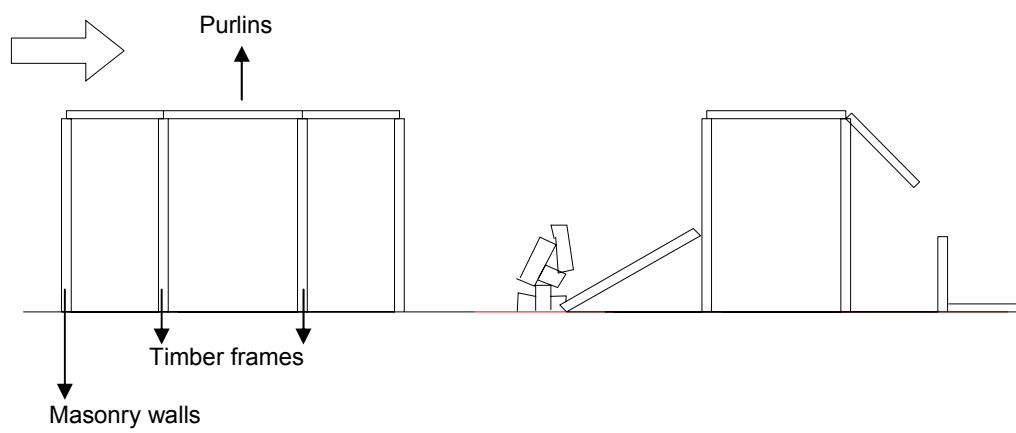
Failure of purlins under lateral force (out of plane)
